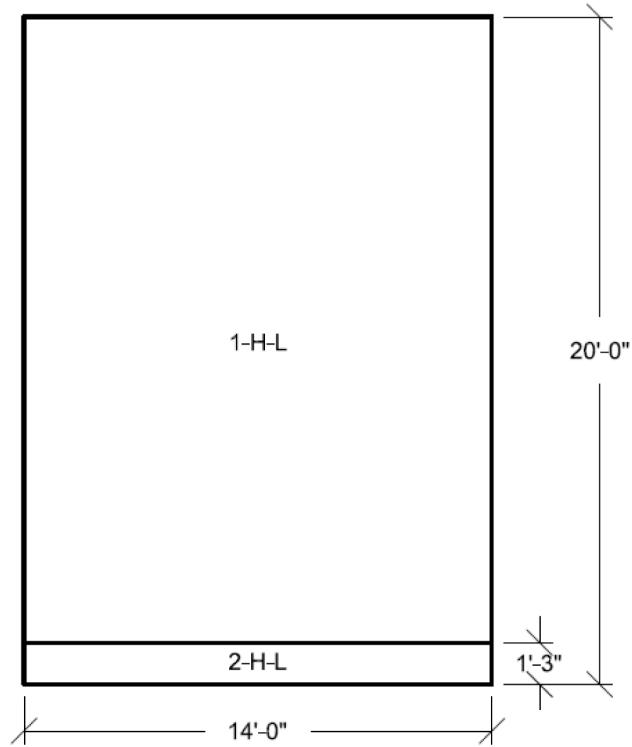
H.6-177 DGFO SV Wall 10 Looking From Outside Horizontal Reinforcement Zones Near Side Face
